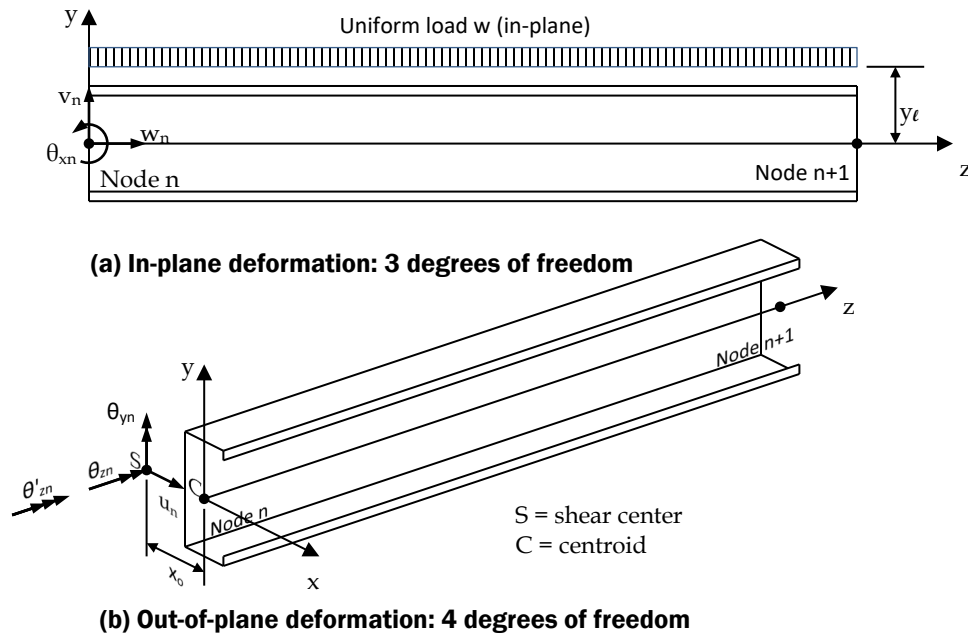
Thin-Walled Linear Element With Nodal Deformations
